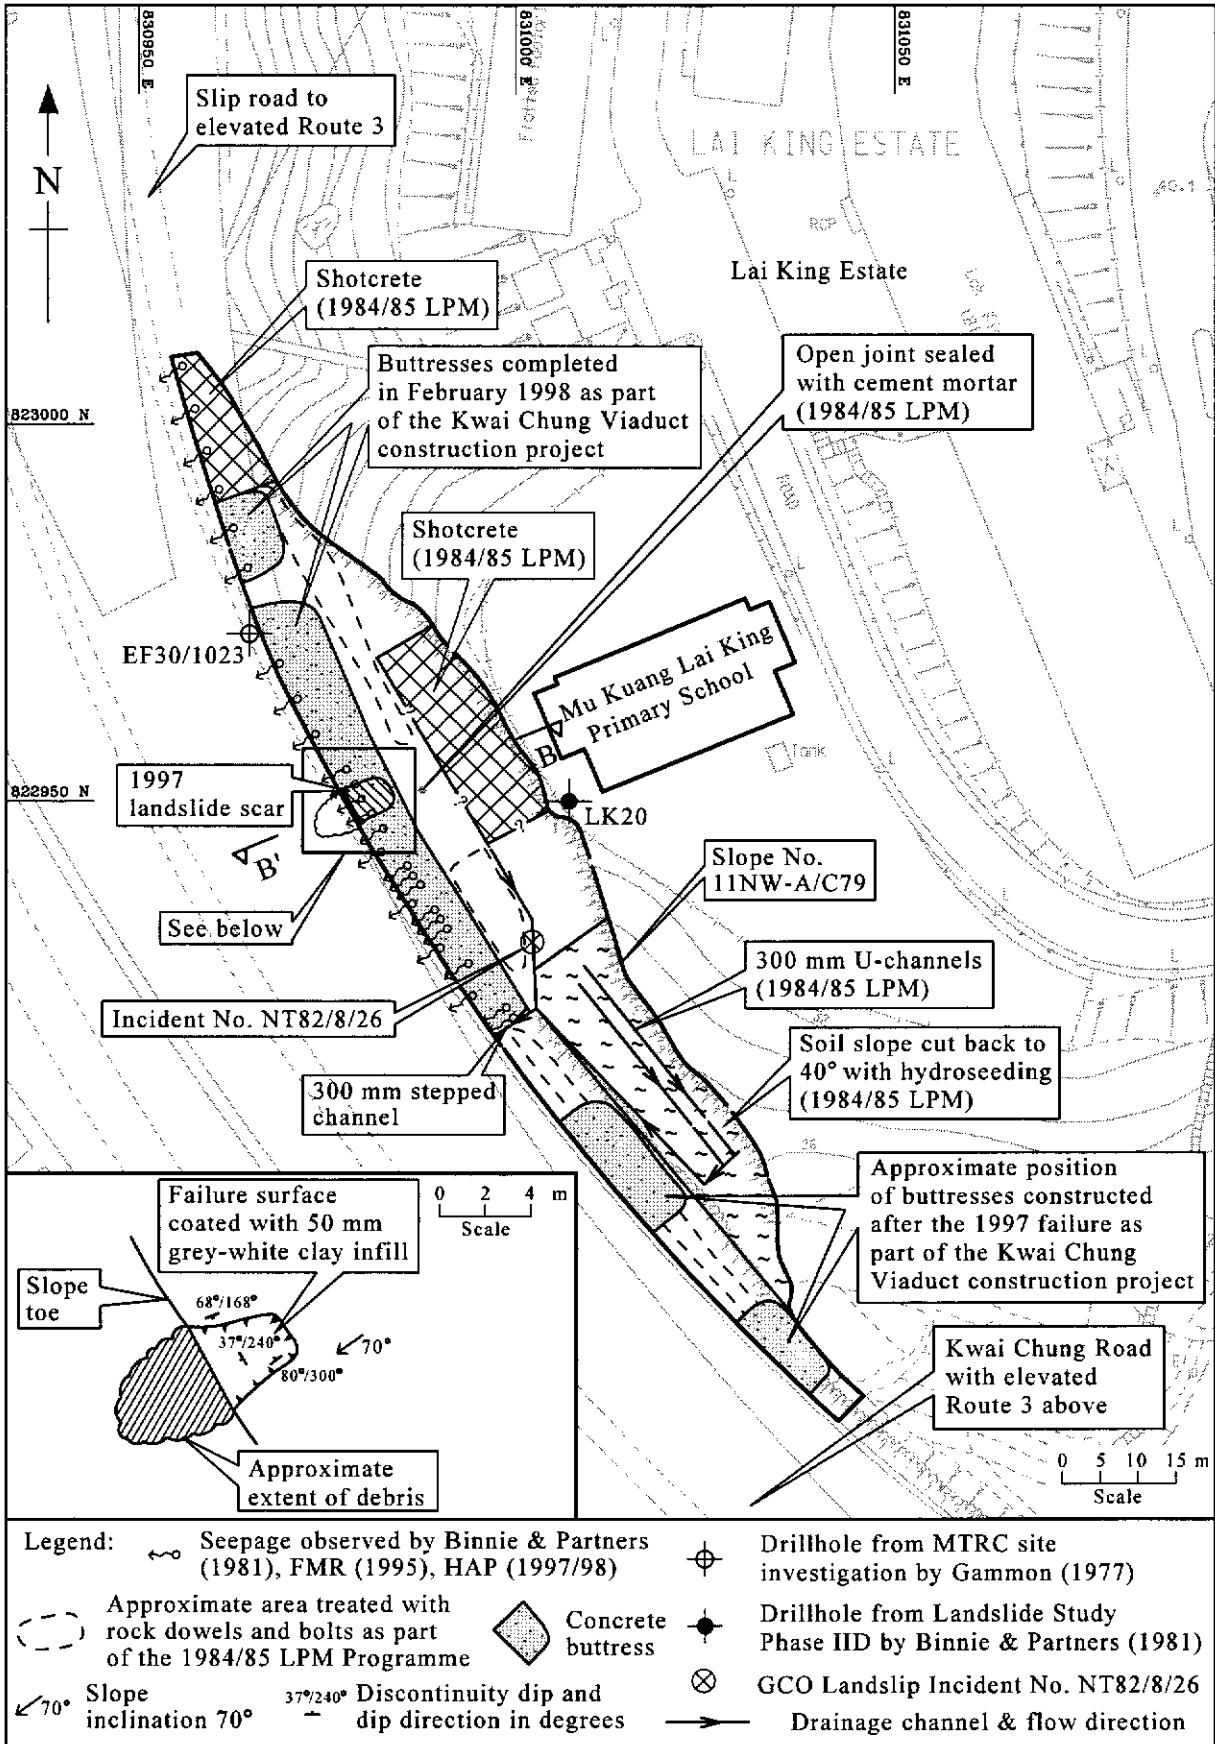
Site Plan (GEO Incident No. MW97/5/6)
